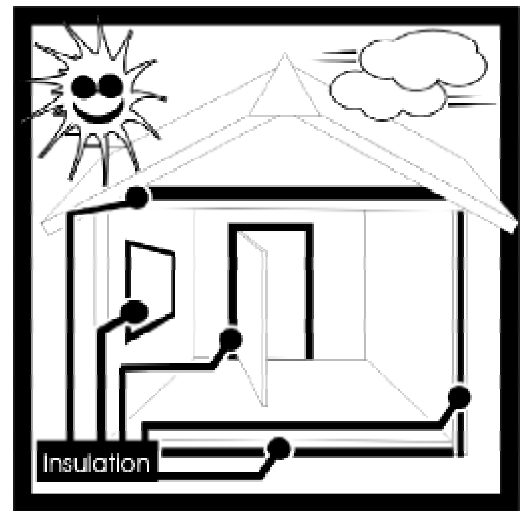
Buildings are able to be insulated in the roof, floor and wall spaces in addition to the weatherisation of window and door cavities.
